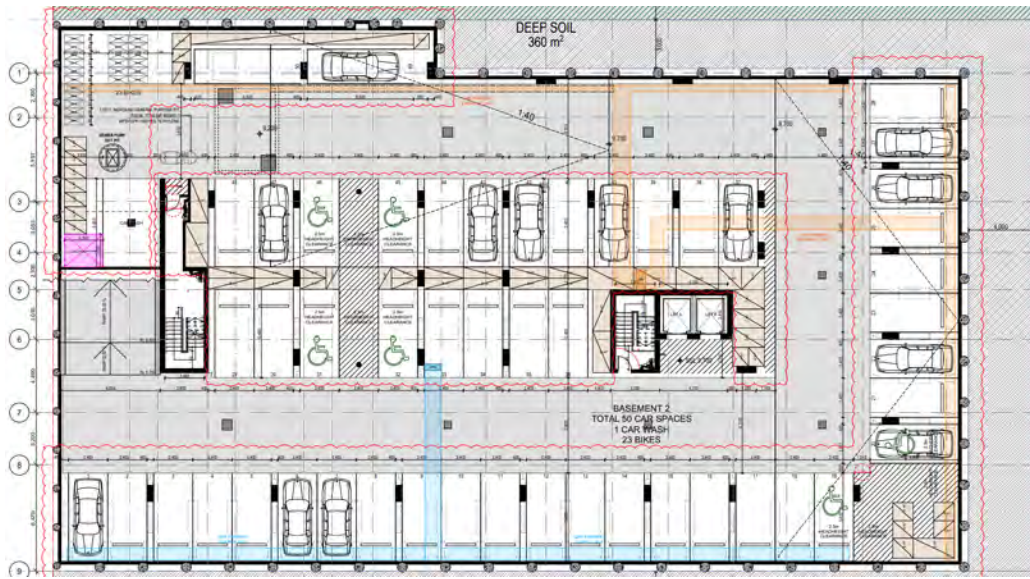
Proposed basement 02 plan showing proposed reconfiguration and 50 car parking spaces.
